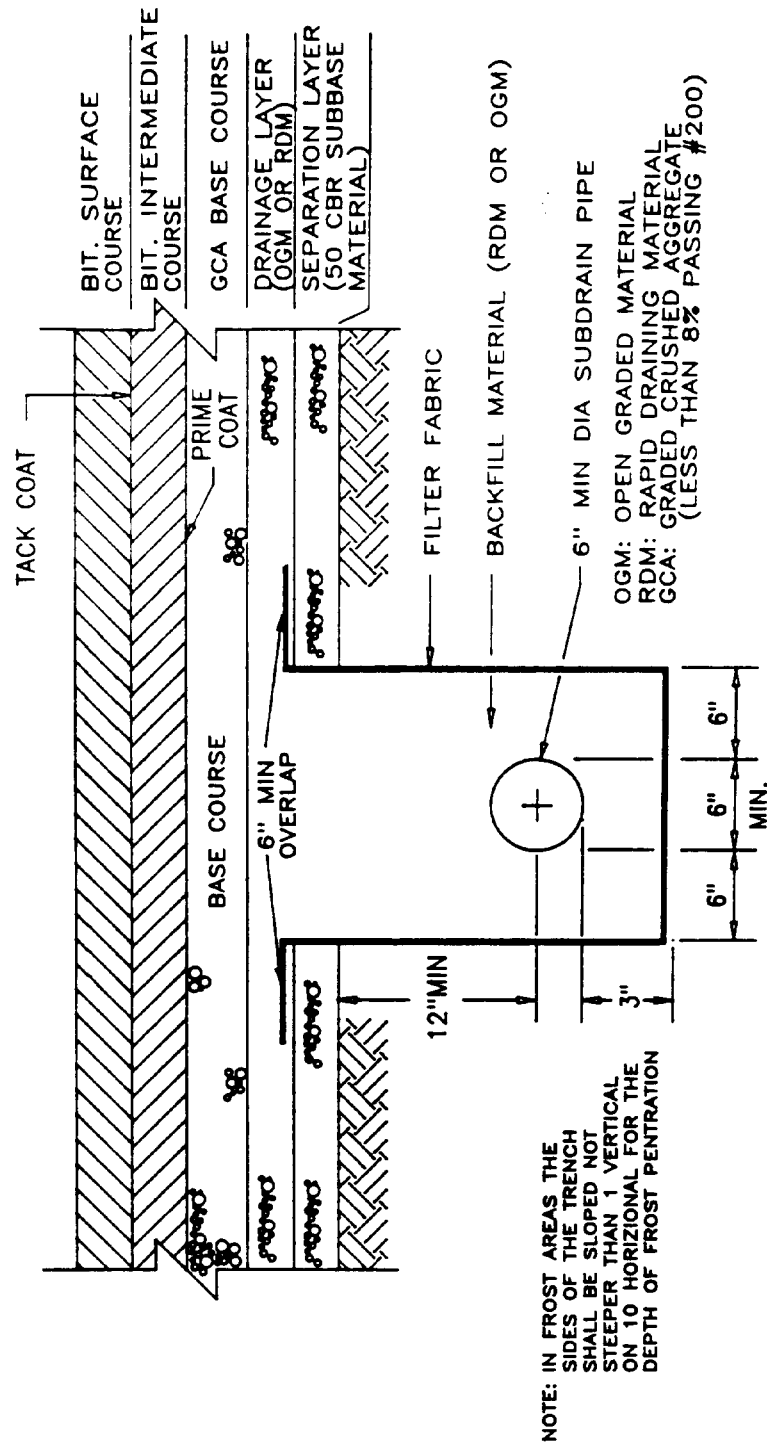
Typical Bituminous Pavement Interior Subdrain Detail
